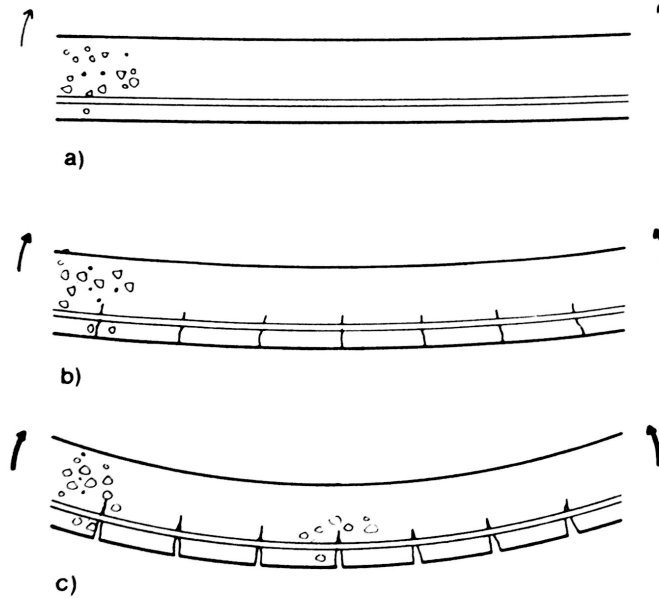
Flexural cracking: a) Concrete uncracked with low steel stresses; b) Fine cracks and increased steel stresses and c) Wide cracks and high steel stress. (Anchor, 1992)
